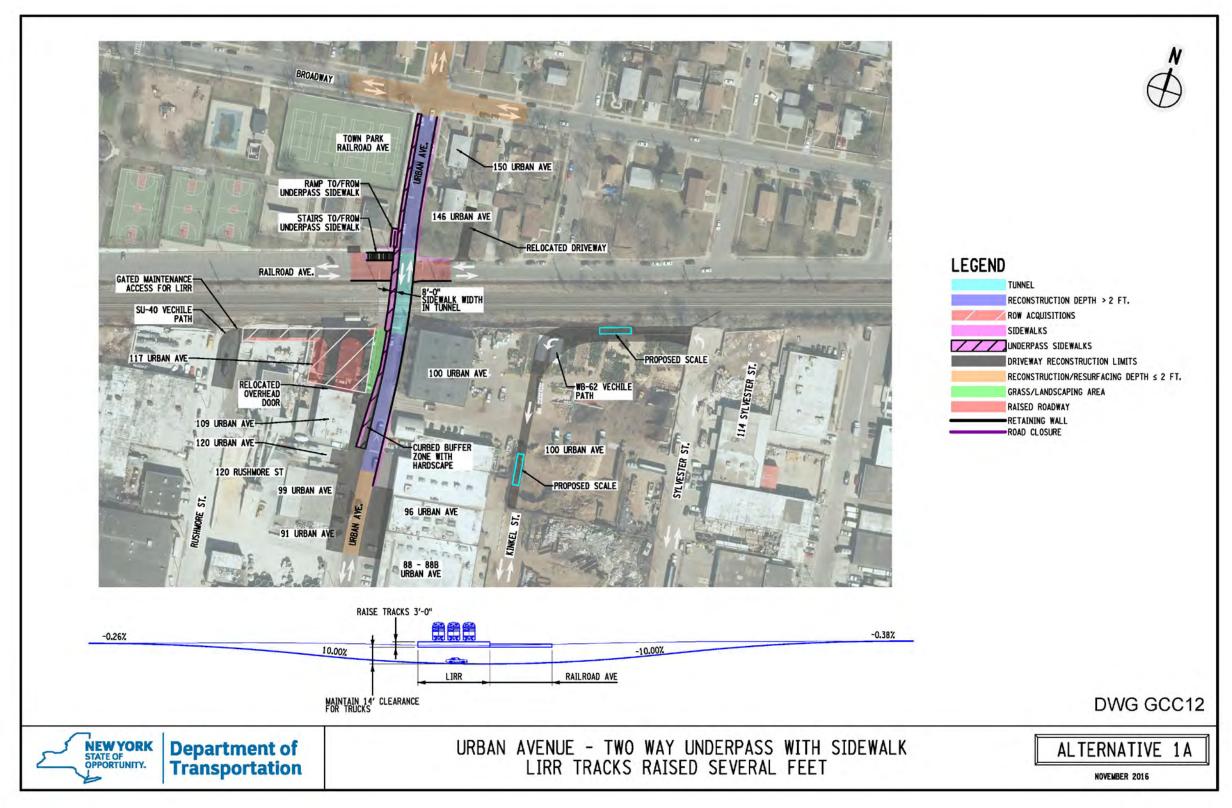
Urban Avenue (Alternative 1A: Two-Way Underpass with Sidewalk and LIRR Tracks Raised Several Feet)
